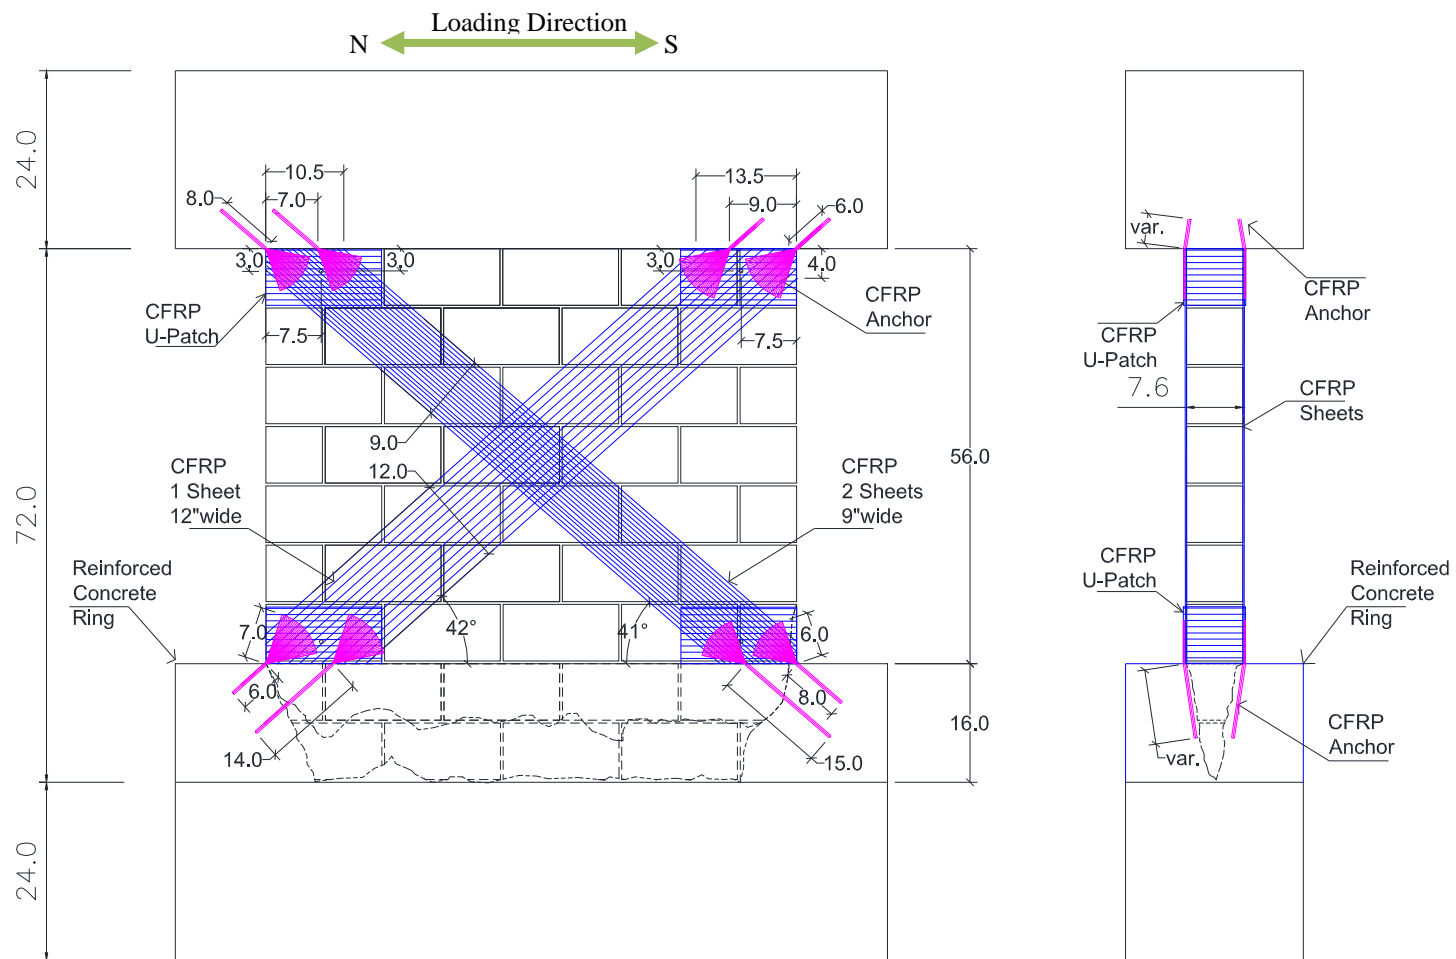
Front view (left) and side view (right) of the details of the application of the CFRP materials. Units in inches
